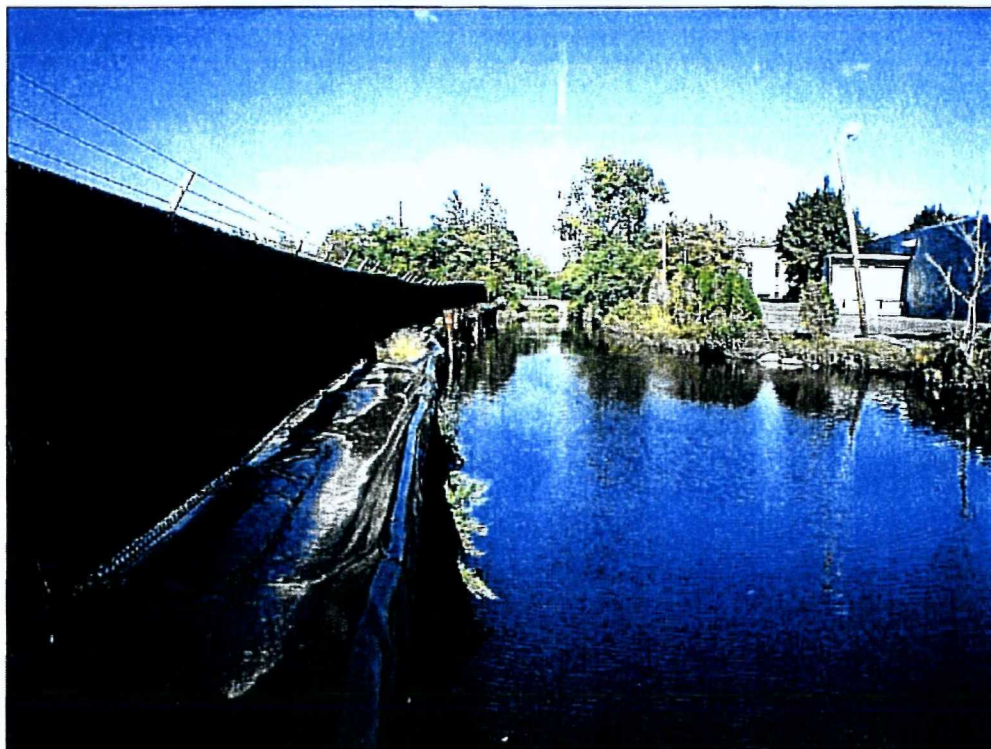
Photo F – View, facing northwest, of the existing sheet pile bulkhead adjacent to Peach Island Creek.
